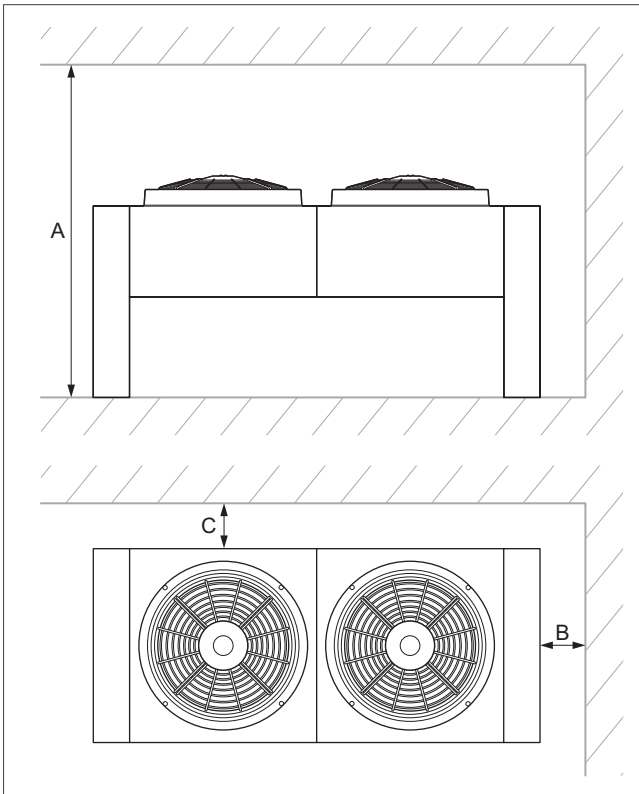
Minimum clearances, ground installation and flat-roof installation
